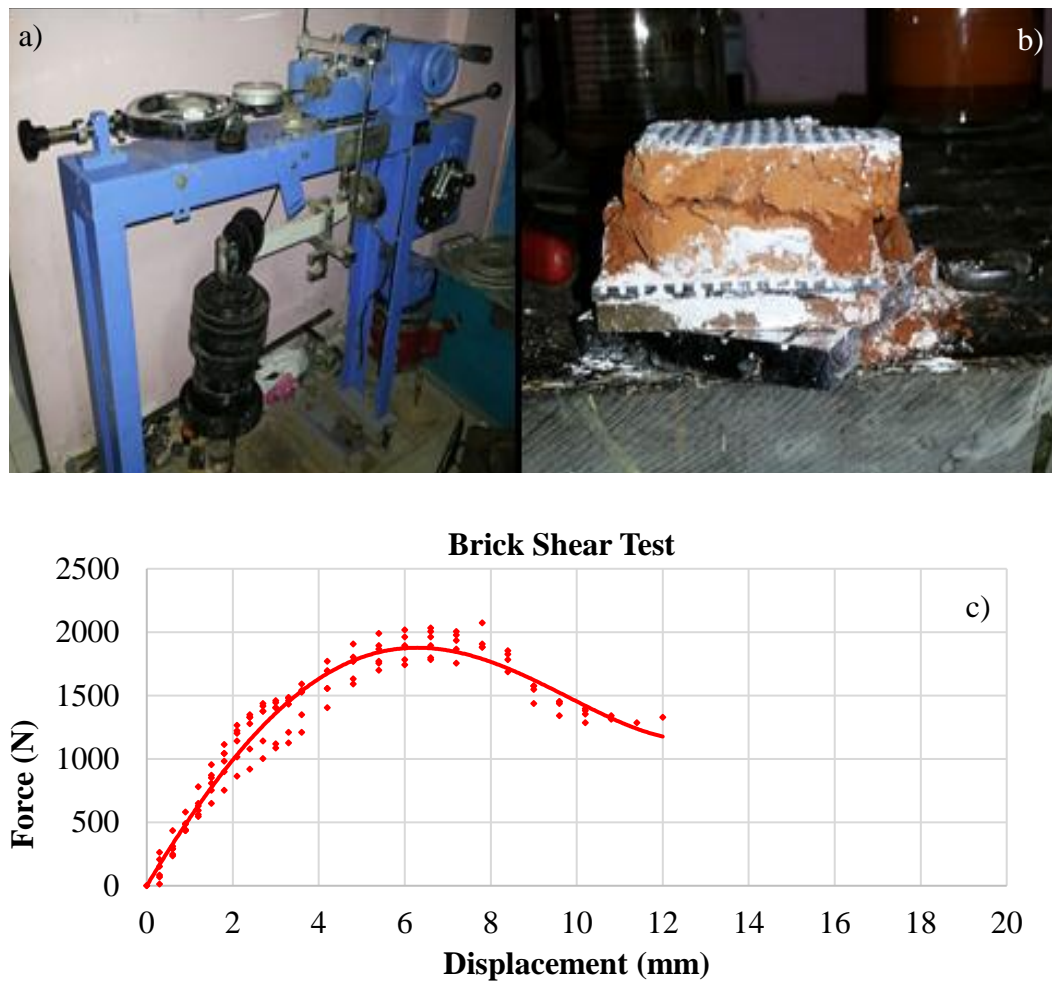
(a) Brick shear test test set-up, (b) Typical shear failure observed and (c) Brick Shear Test Results
